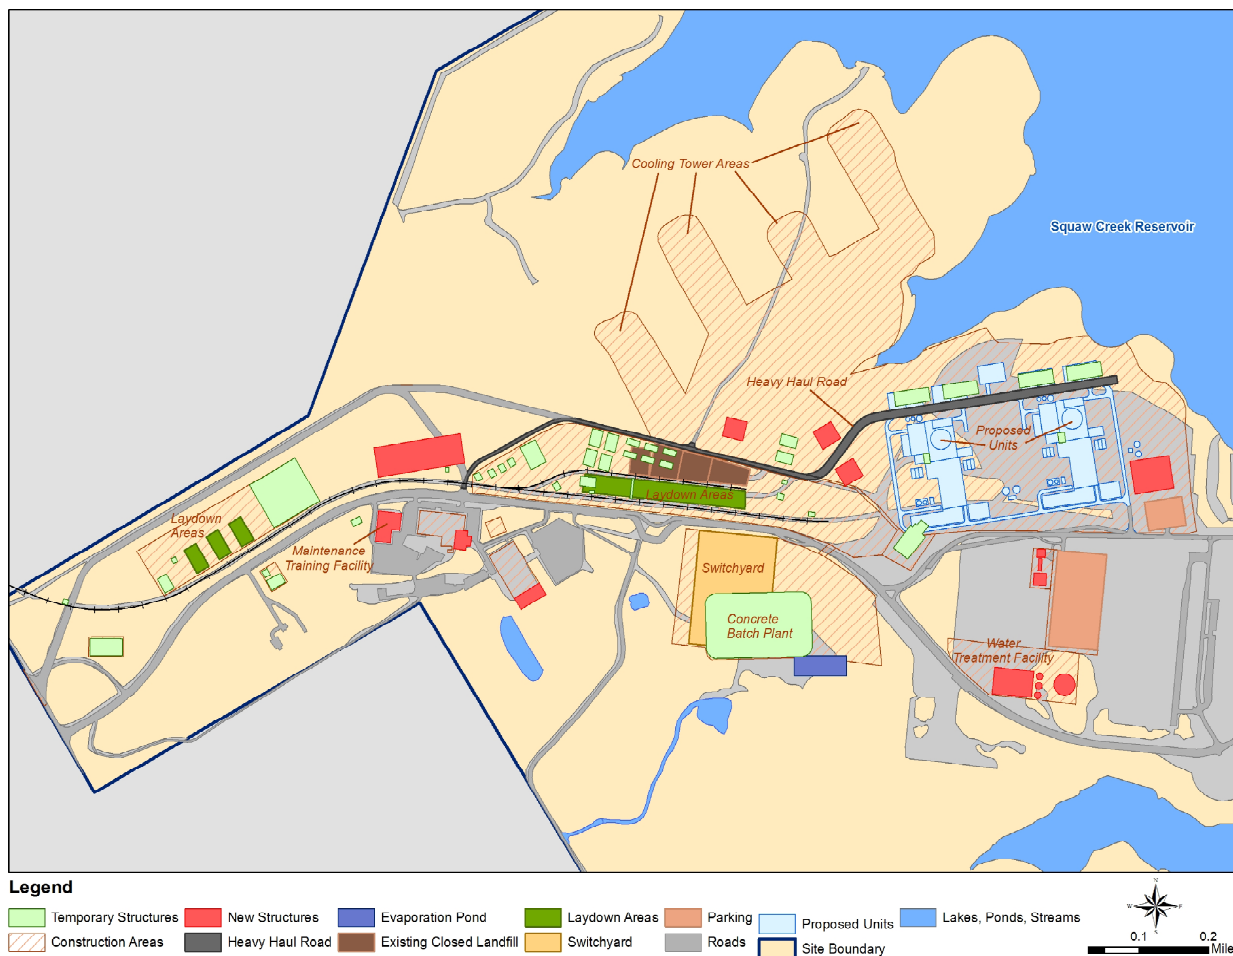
Detailed Site Plan Showing Construction Laydown Areas (Luminant 2009a)
